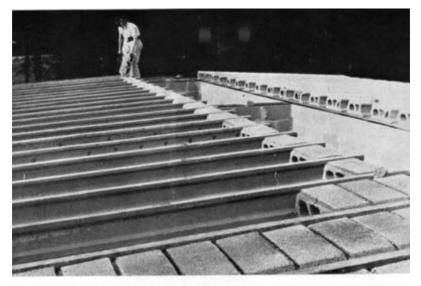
One of the types of flat roof construction. Its insulation from walls by felt is visible.
